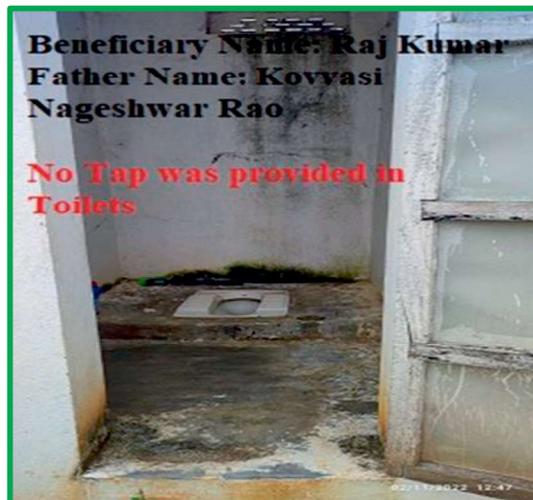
to 6.5: Photographic images related to non-provisioning of additional facilities viz., No plinth protection, pathway to the house, no wash place, no tap points provided.
